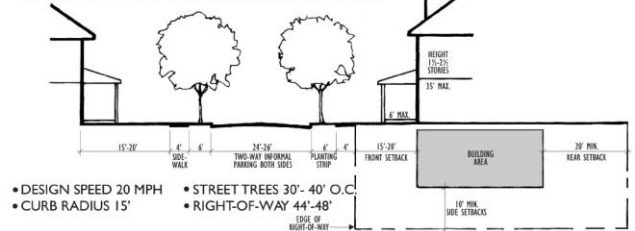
TC-B TYPICAL STREET HEIGHT AND SETBACK REQ
